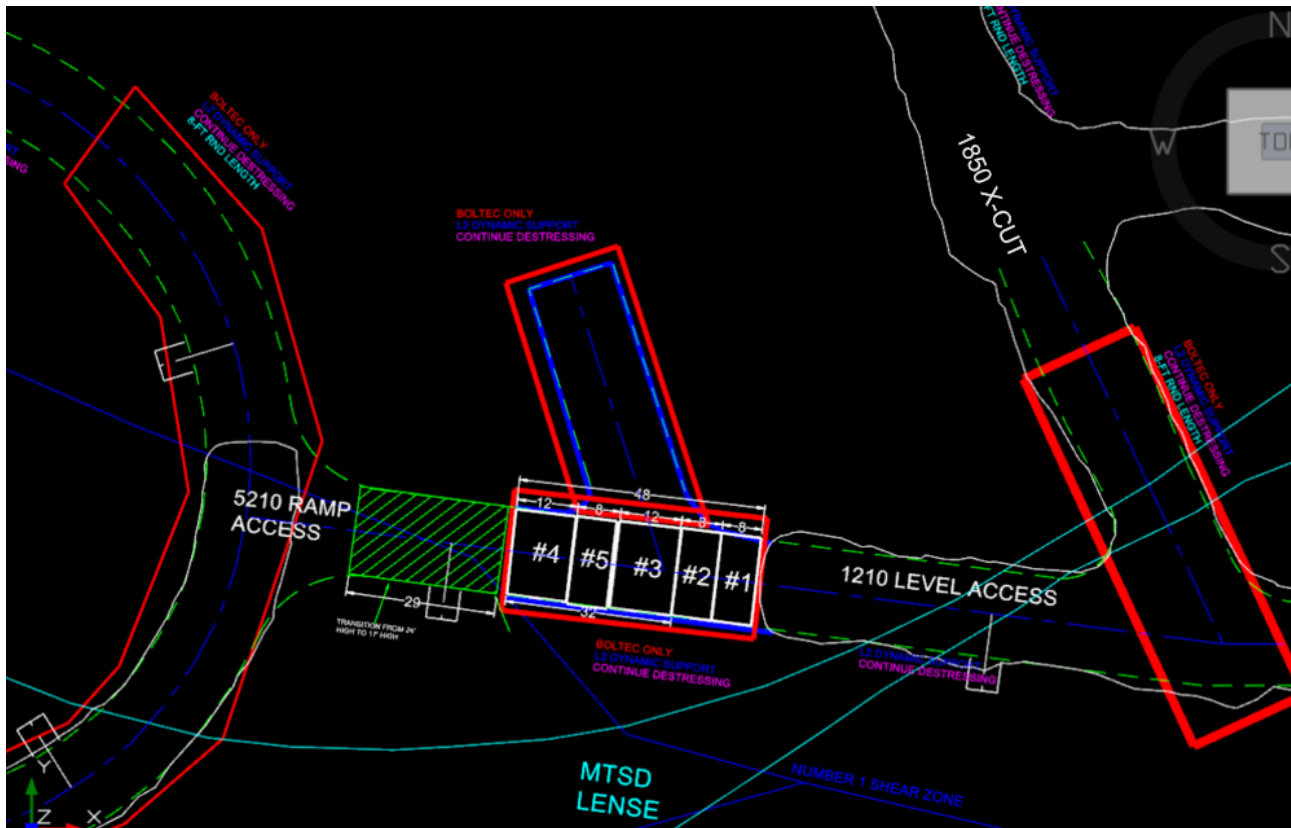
Plan view of the breakthrough in the 1210 Level access on 5300 Level
